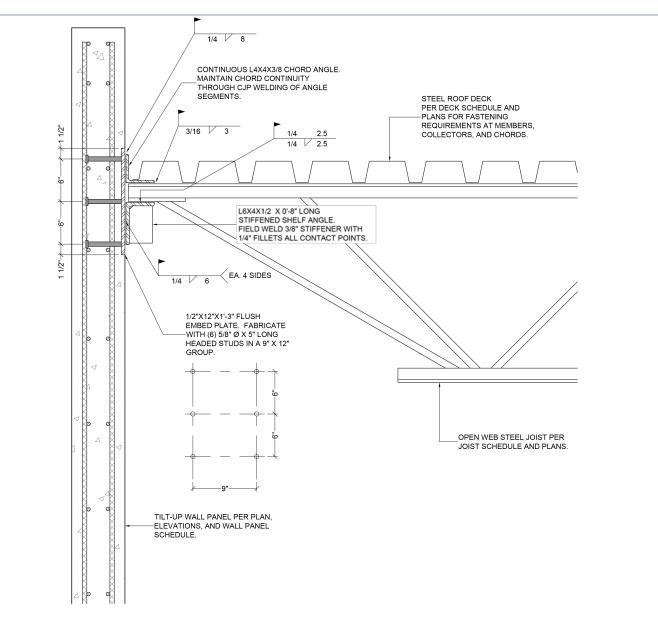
Engineer's typical detail showing roof framing attachment. This information is notable for the WWR detailer in order to identify embedded anchorage features that could result in spatial conflict with intended positioning of the wall reinforcement. The presence of embedded components requires special attention when WWR mat configurations are being derived to ensure compatible alignment. (continued on next page)
